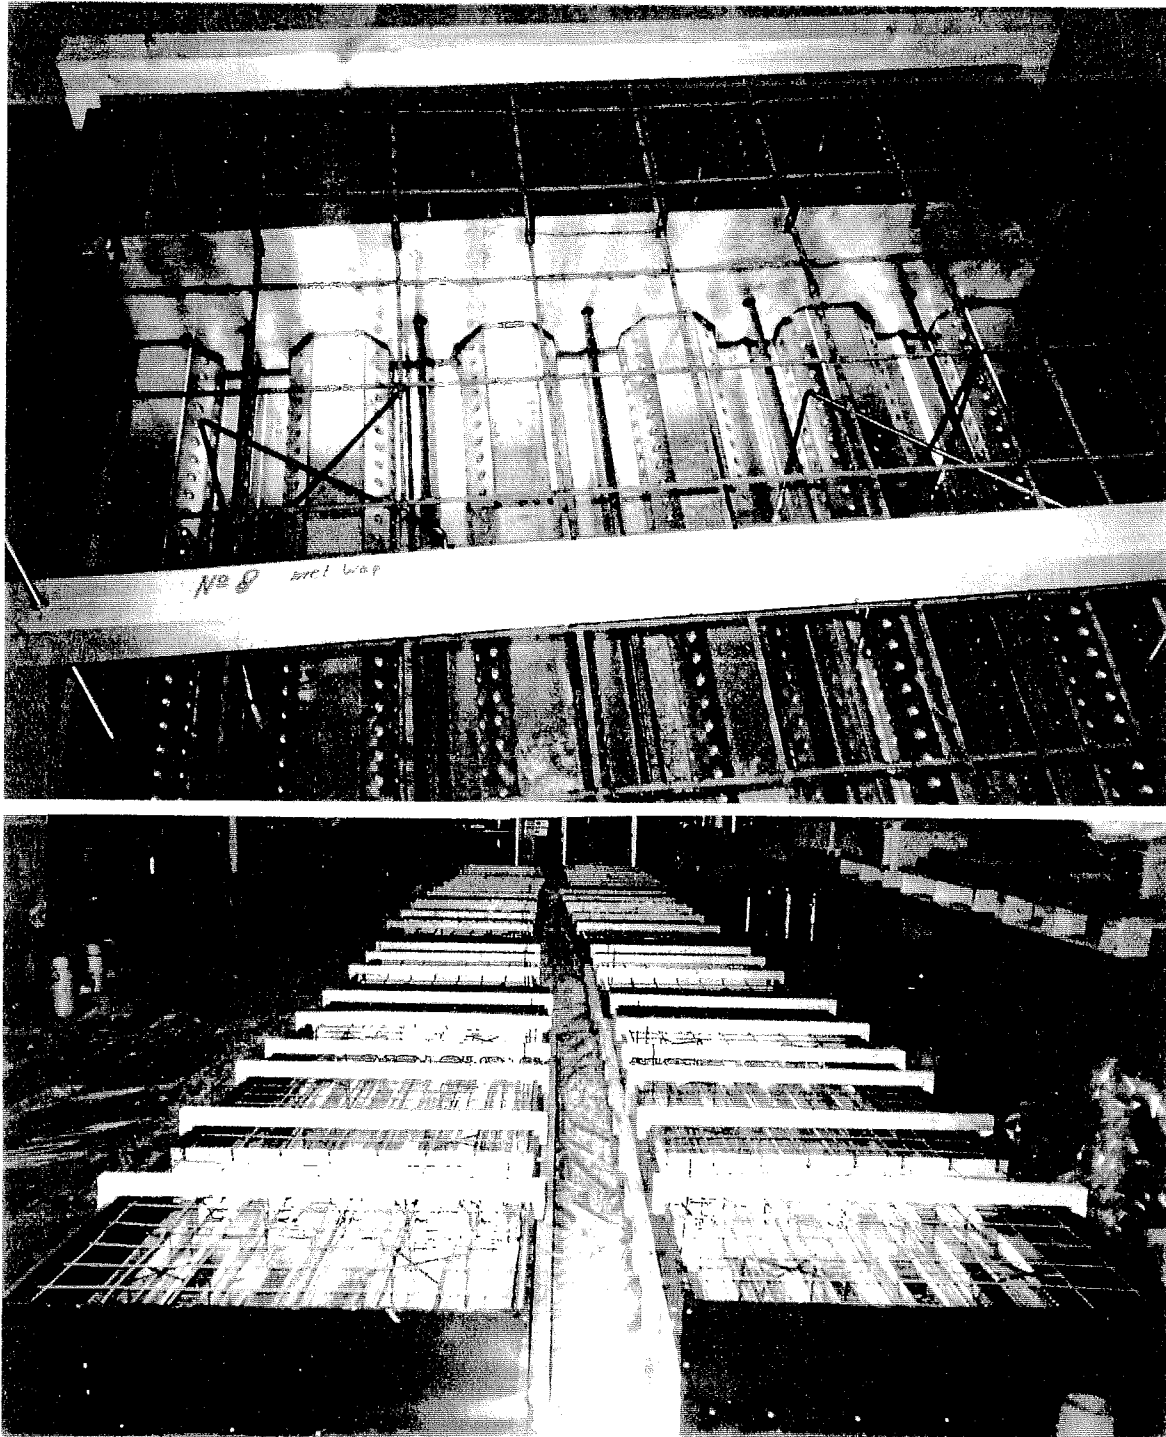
Photo of decking installed in formwork, as delivered to TNO, ready for concreting.
